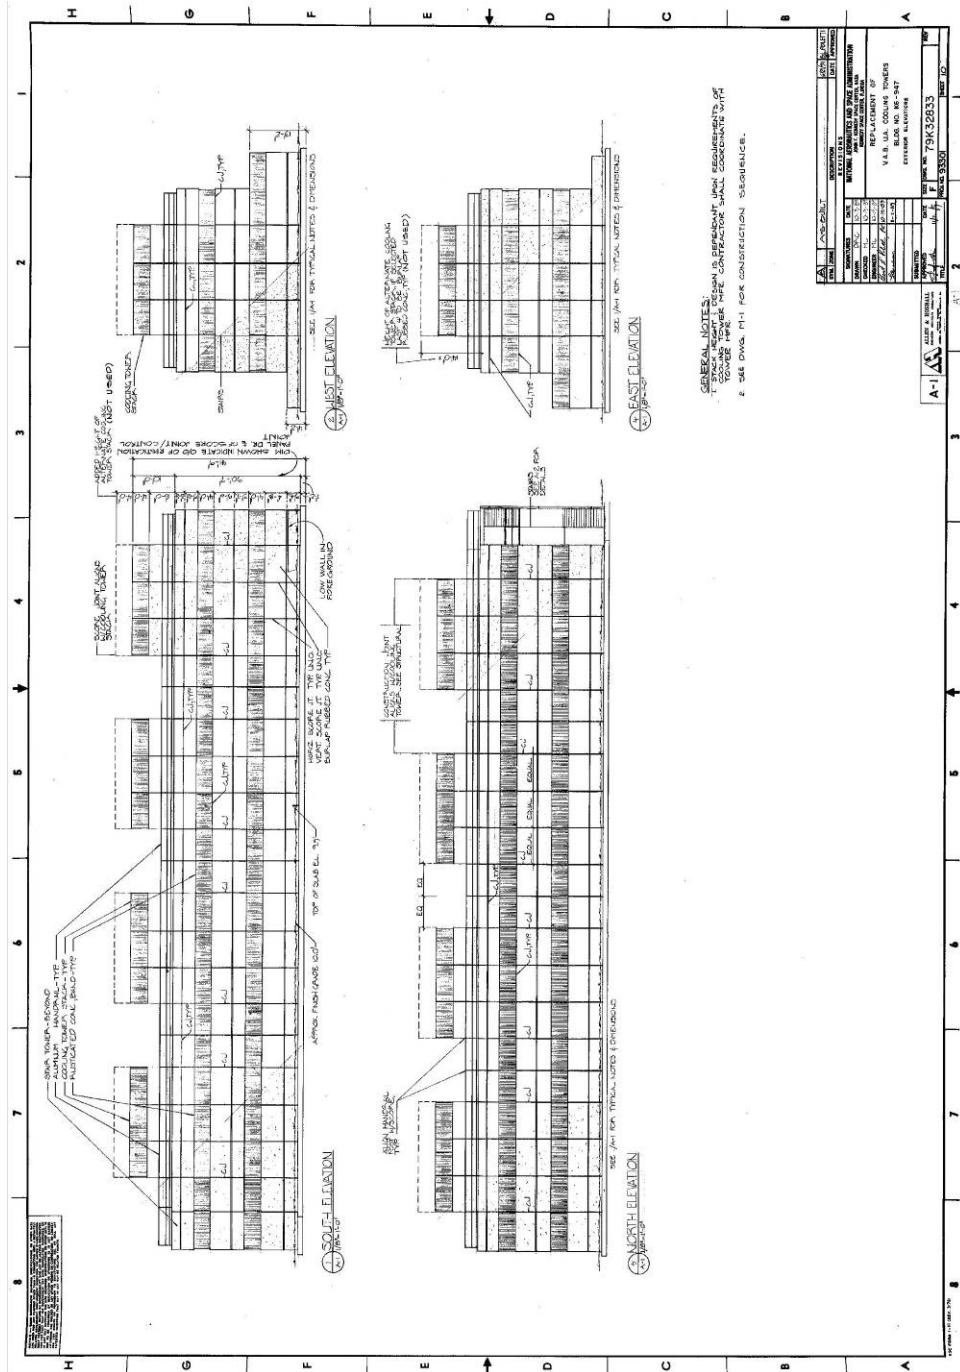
Allen & Hoshall, "Replacement of V.A.B. U.A. Cooling Towers, Bldg. No. K6-947," Exterior Elevations, November 1989, Sheet 10.
